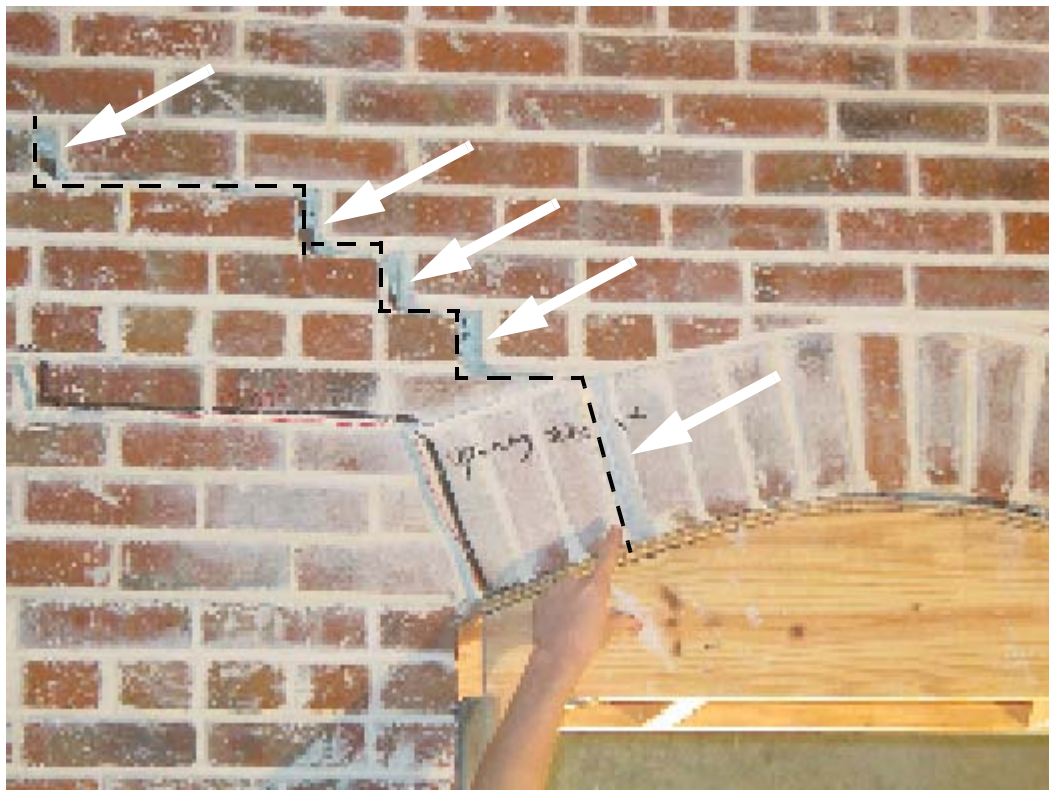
Photograph of the upper portion of pier PA-10 (from the inside of the structure) illustrating the residual crack opening following Test Run 33.
